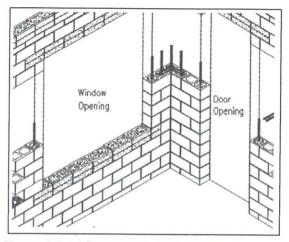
Starter Bar at Place Has Opening (Source: Modul Pemasangan CMU Projek PPR Tanjong Karang)
